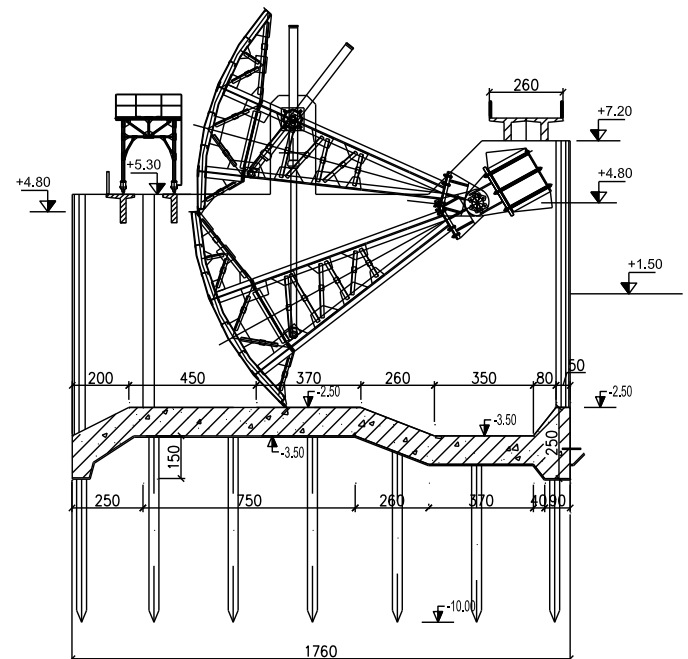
Longitudinal section of Bao Van sluice in thanh Hoa
